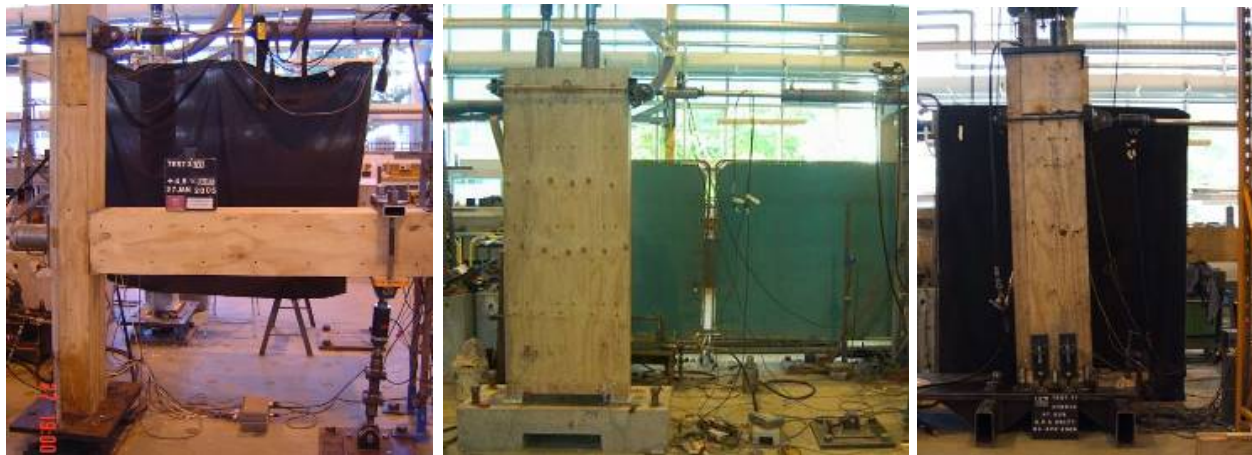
Exterior beam-column joint, wall-foundation, column-foundation test specimens [24]
